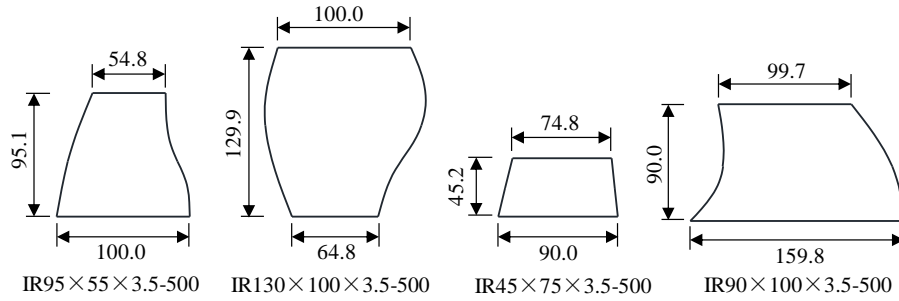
Measured outer cross-sectional dimensions (in mm) of irregular hollow section specimens
